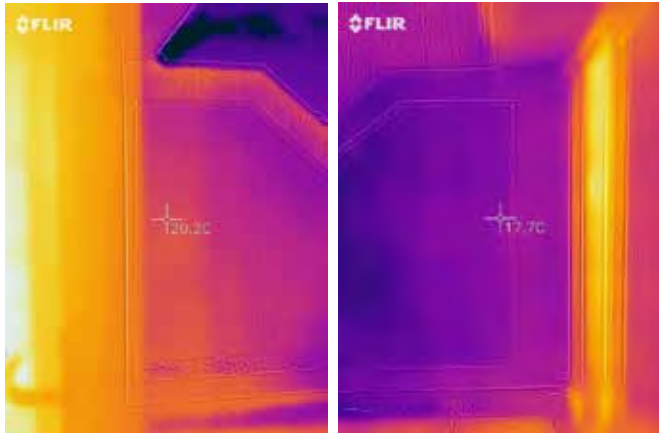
IR photo of external part of heated wall and external part of unheated wall
